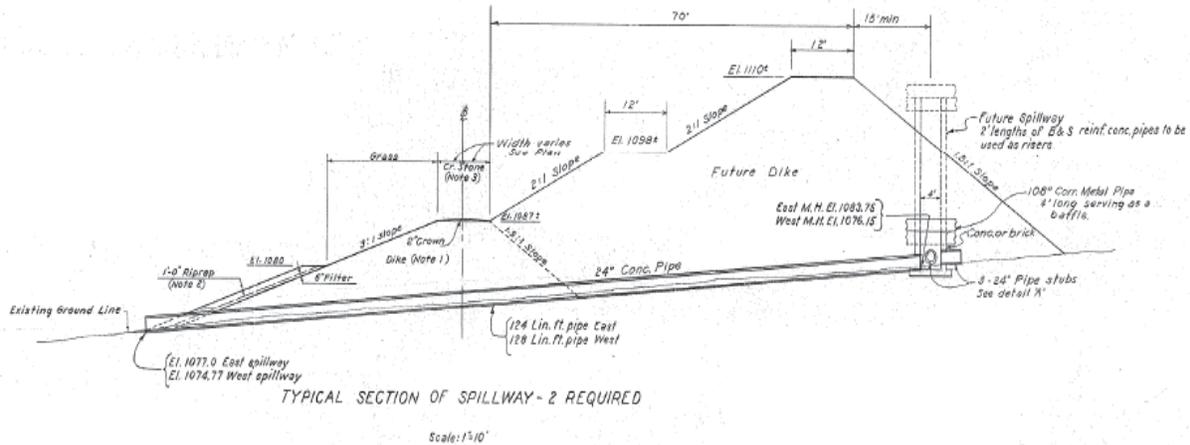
Starter Dike Typical Section 1953 (Revised 1958)
